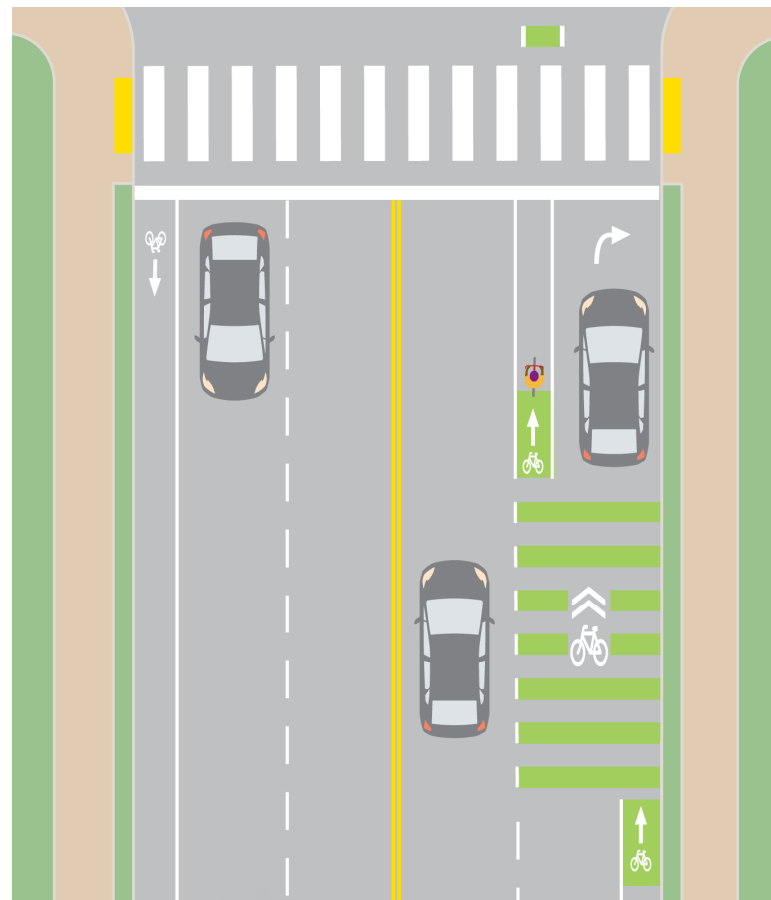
BICYCLE PAVEMENT MARKING APPROACHING AN INTERSECTION
